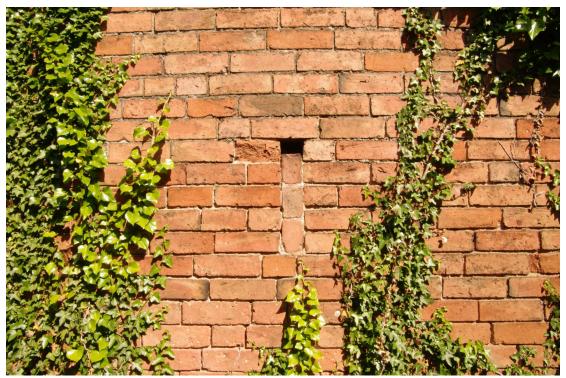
Barn 2, south-east facing elevation blocked ventilation slit Looking north-west
